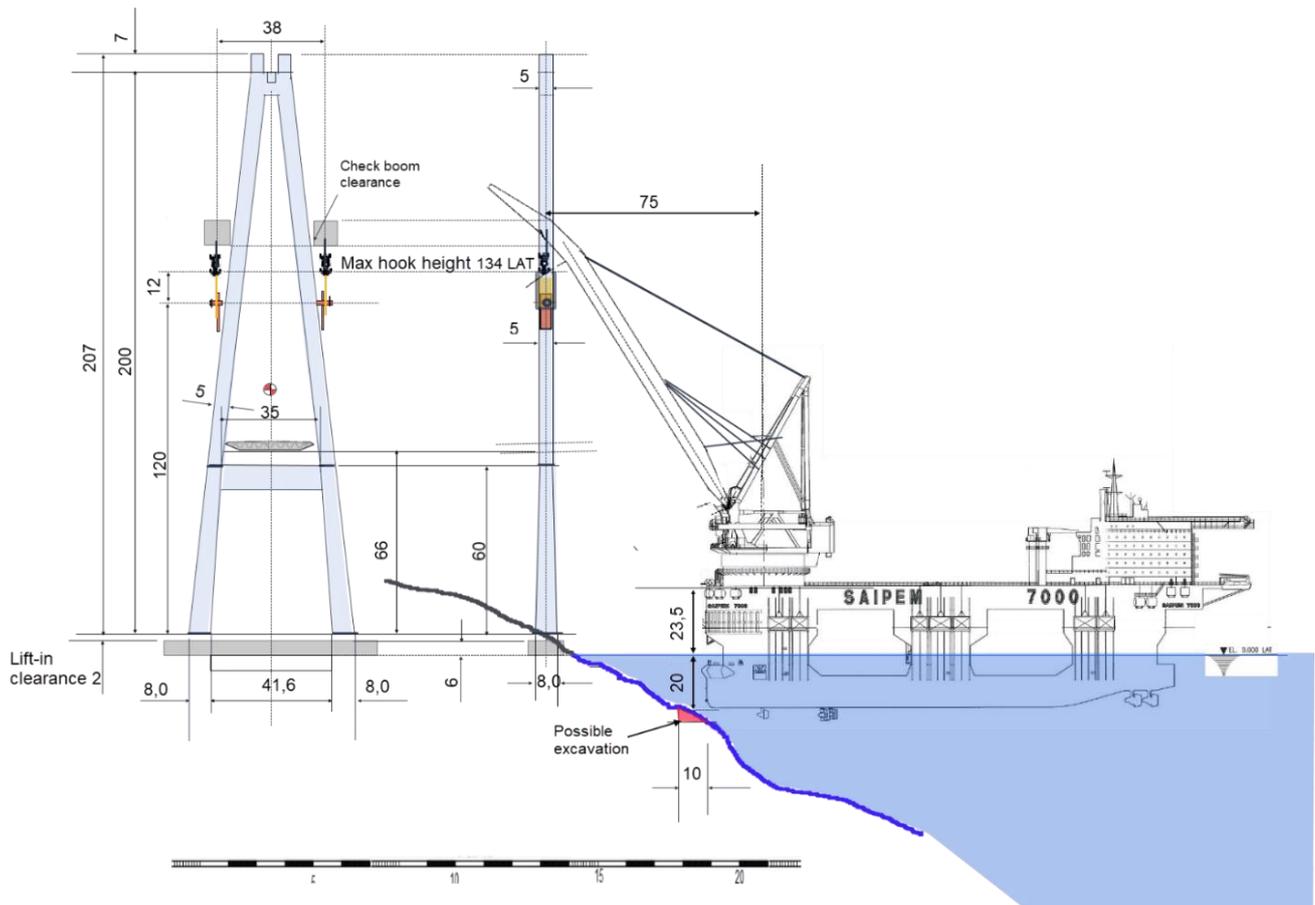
Elevation sketch showing HLV when the A-frame touches bumper guides
